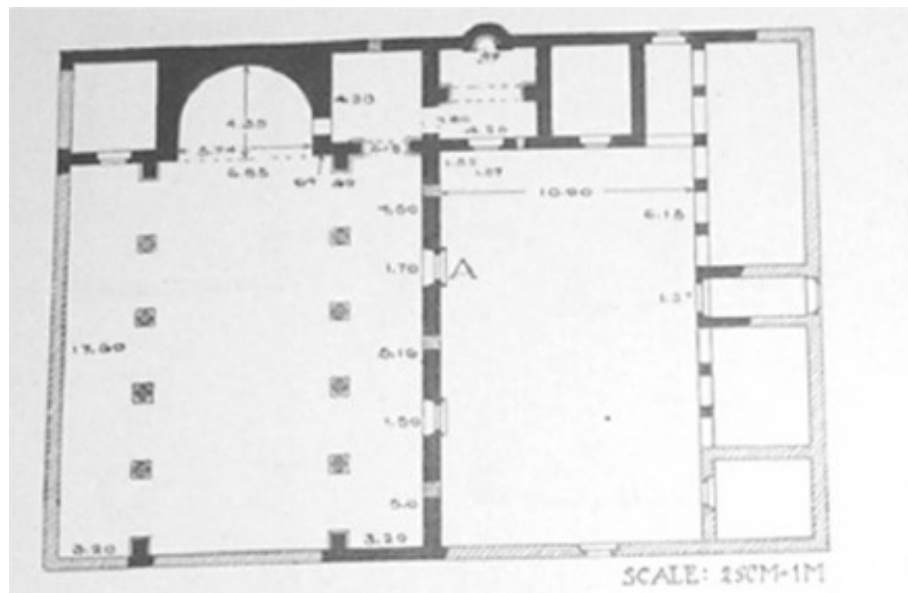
Ksījah (Keseijbe)Church (east church) plan, (*Butler, 1929, p. 50*).
